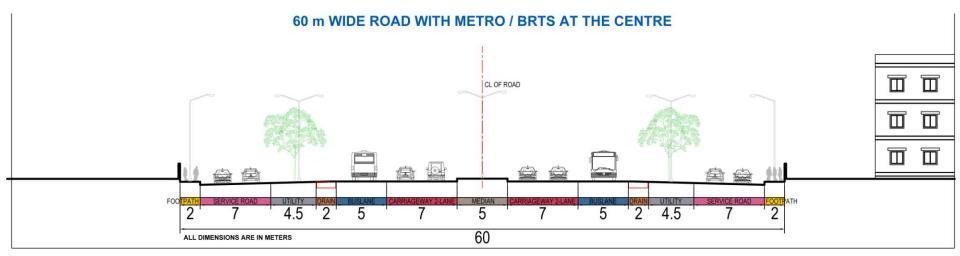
Typical Cross Sections for Major Roads proposed in DP
